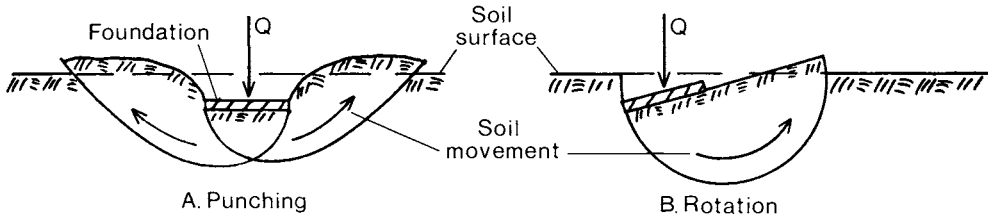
Modes of soil failure under a surface footing.
